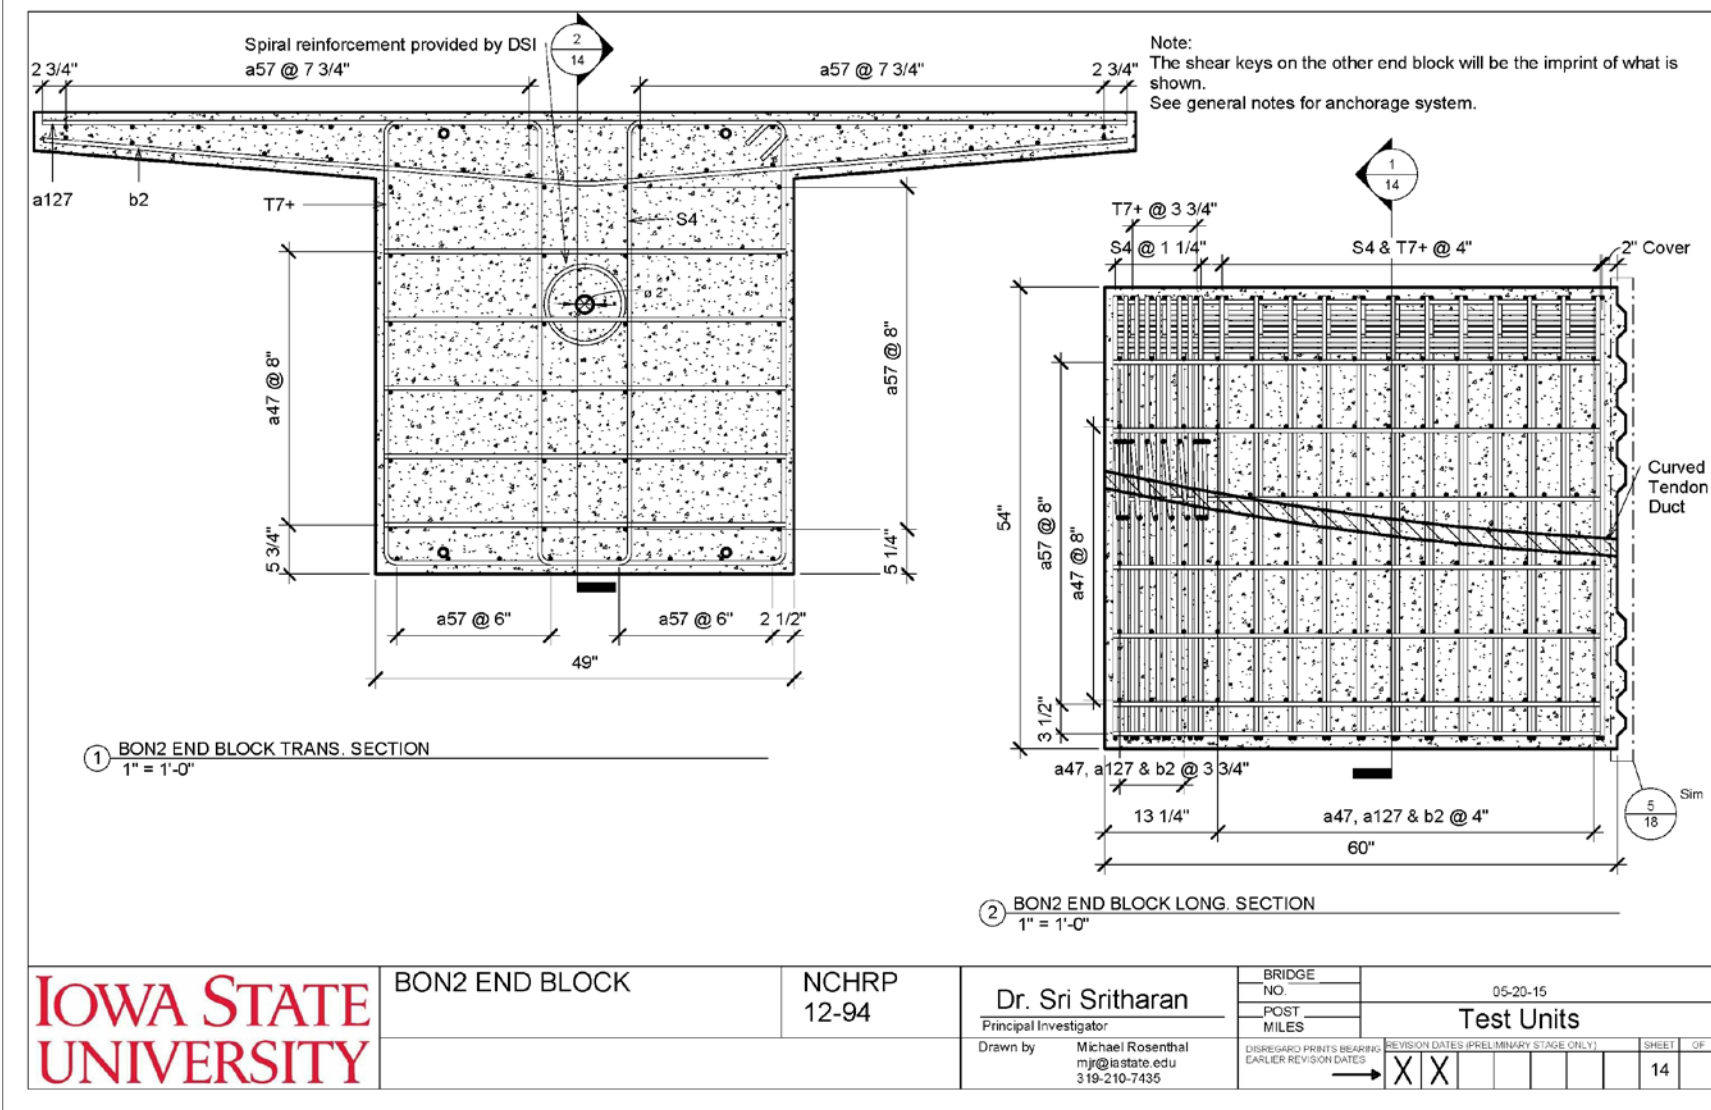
BON2 Typical Longitudinal and Transverse Section
